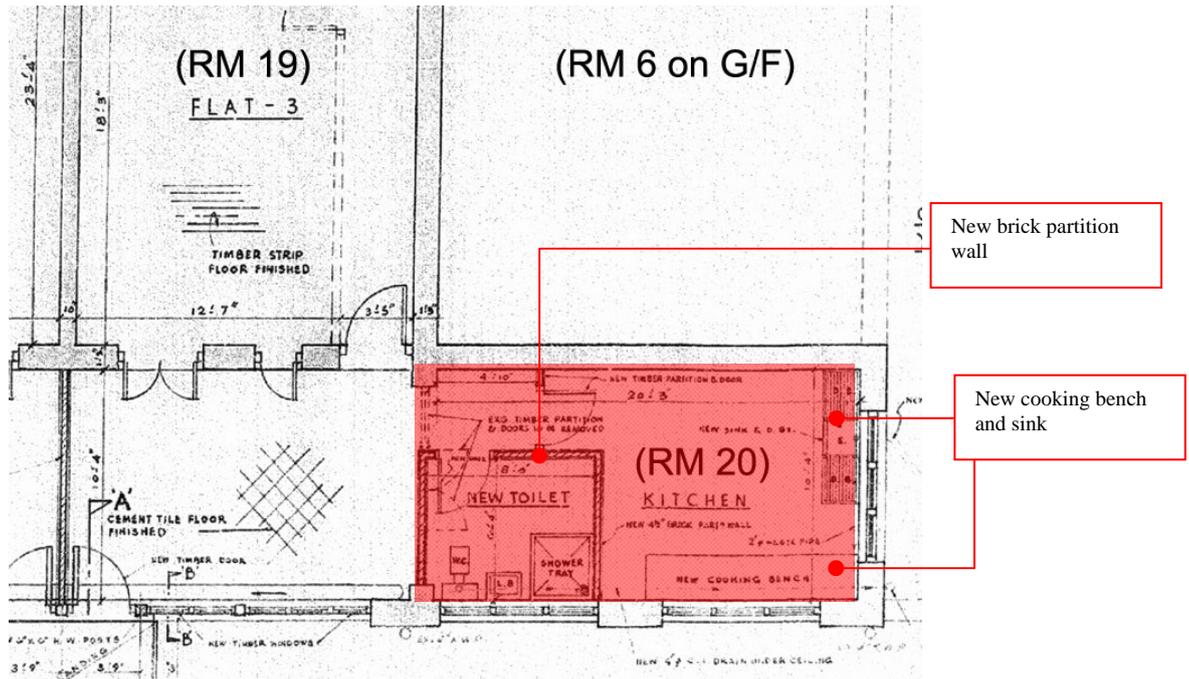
Extracted first floor plan of RM 20 at the main building for the proposed conversion to staff quarters at the Government Stores in 1969. (Courtesy of Architectural Services Department, Hong Kong SAR Government, microfilm no. 003596. (partial))
